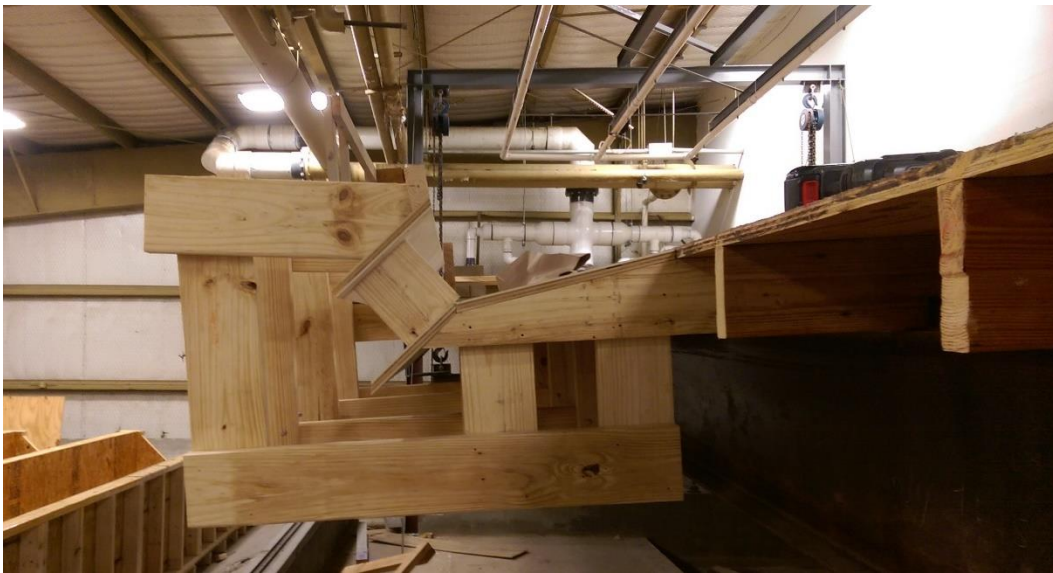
Photo of the side of the 2x6 inch beams used to construct the TxDOT curb inlet, with the steel beam visible to the lower right.
